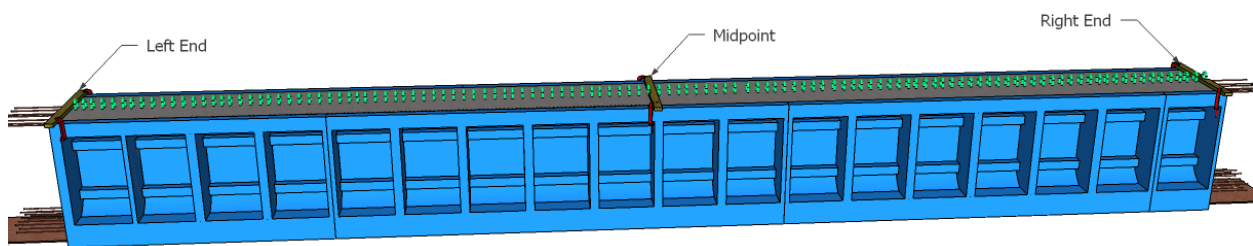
Casting of PPCB with 2x4s to establish flat surfaces
